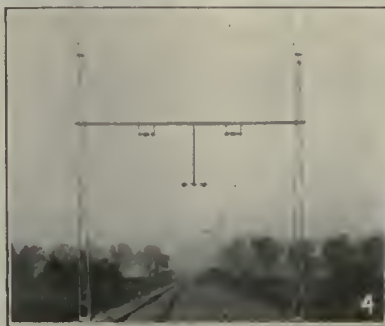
Overhead construction on Midland Railway electrification. Wood-pole and channel-iron strut in foreground; structural steel bridge in background.
